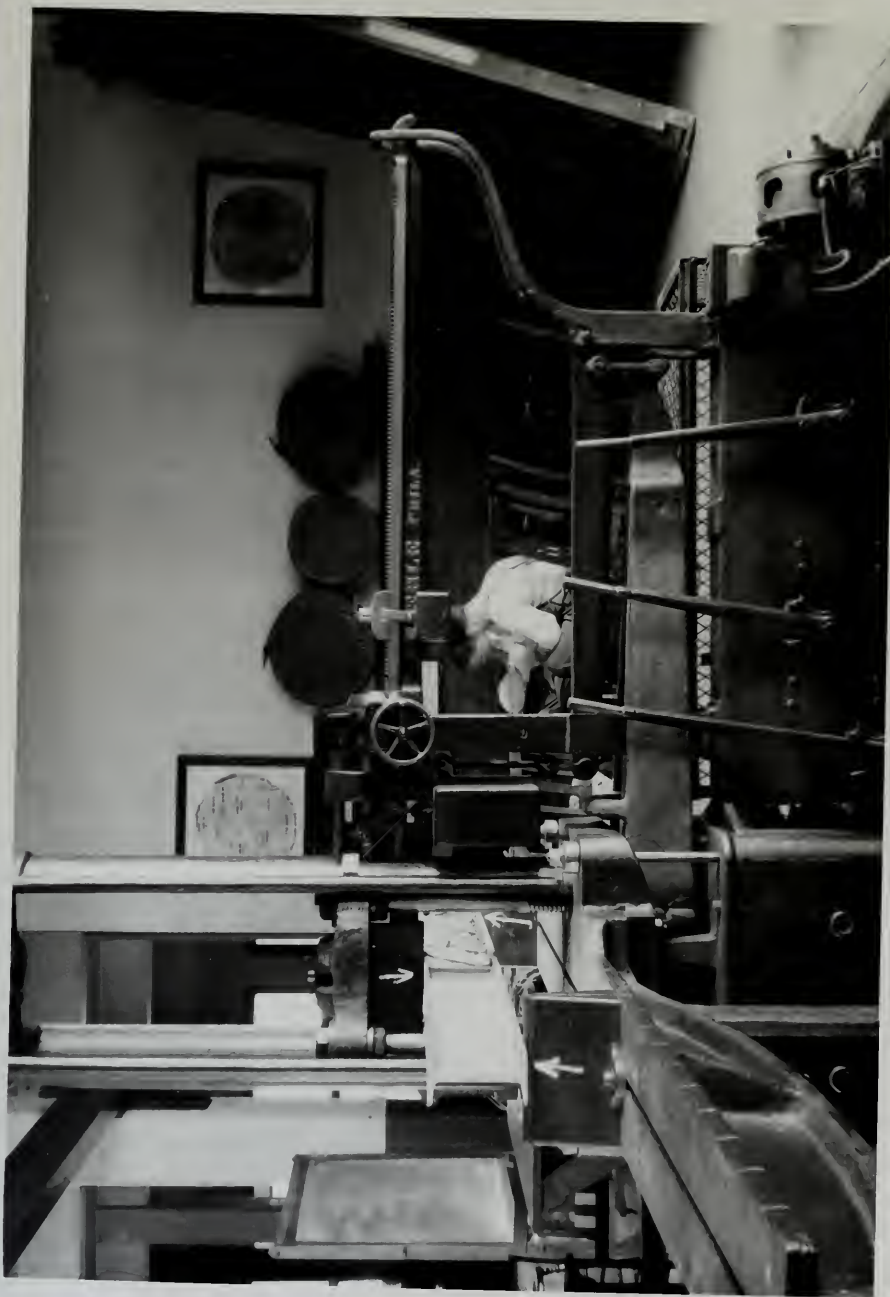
FIGURE IV. Richle Universal Testing Machine with Beam in Position for Loading. Arrows Show Locations of Supports and Loading Wedge.
